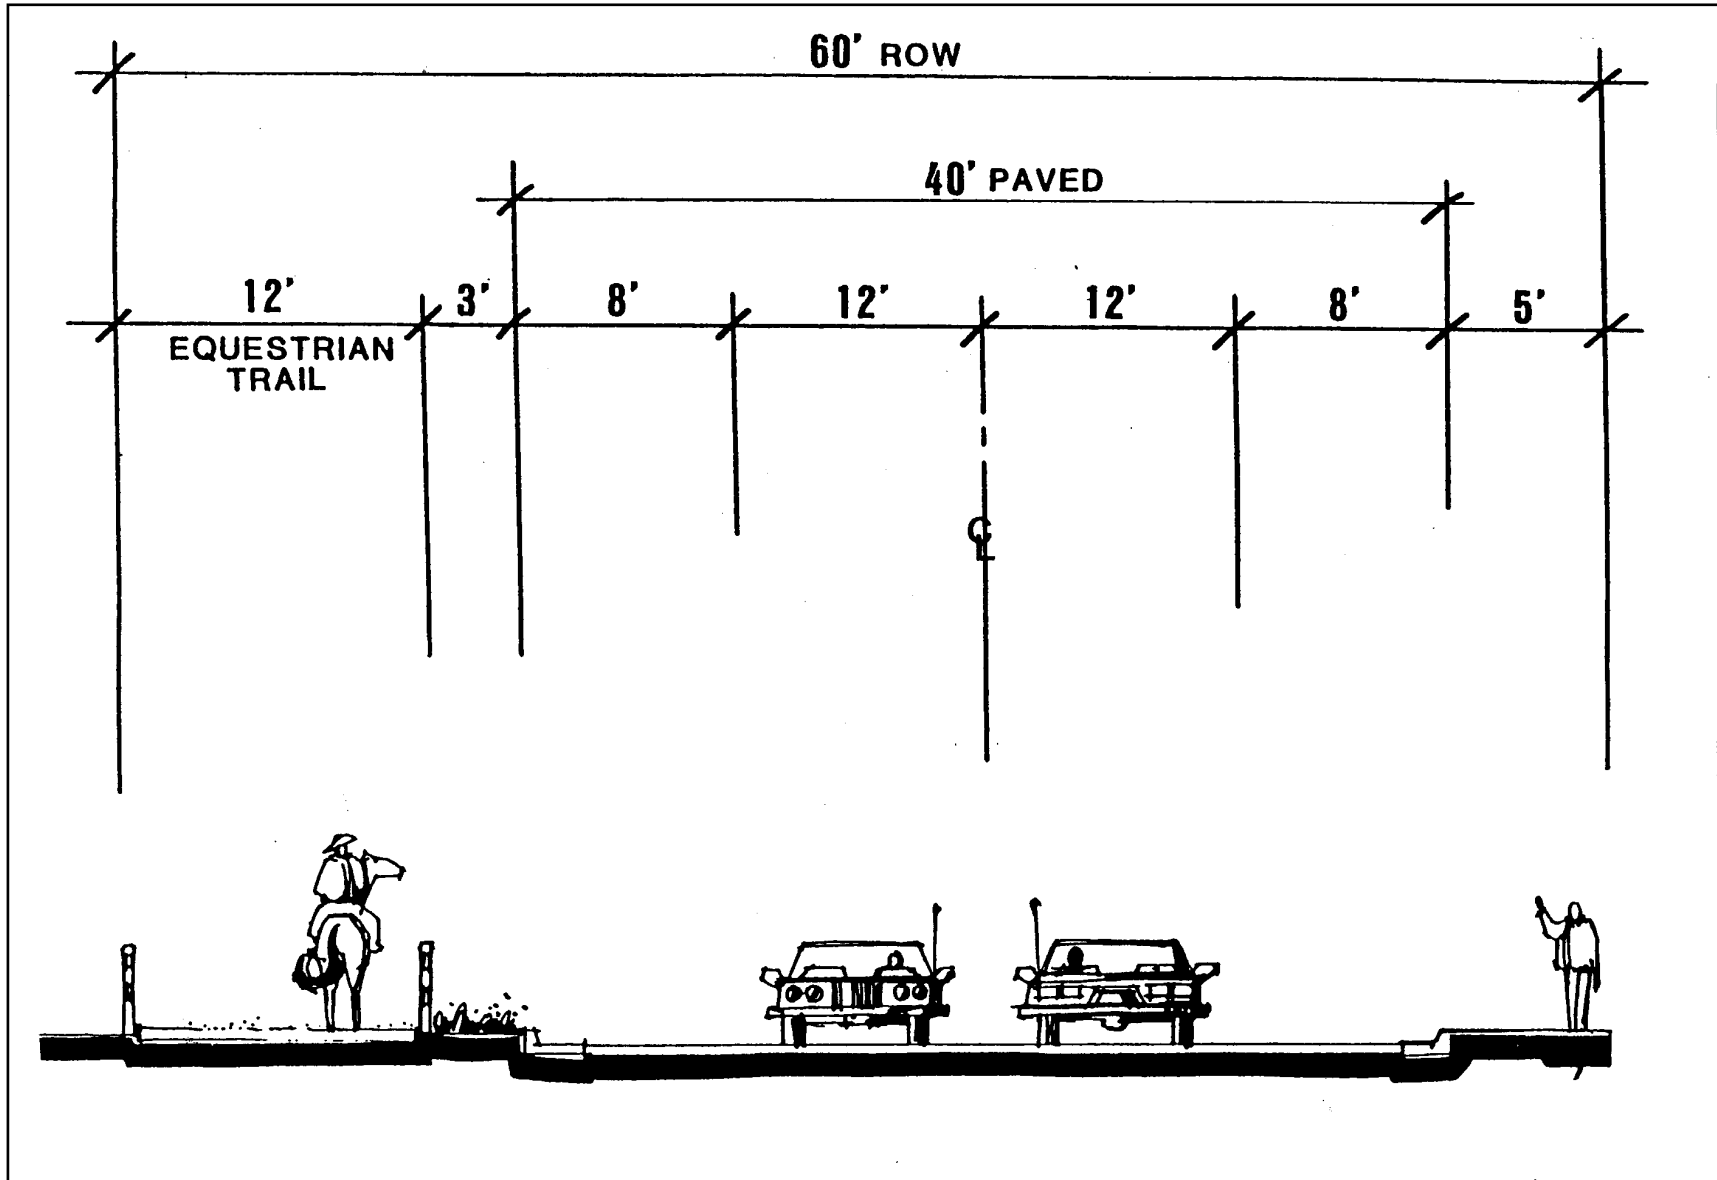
TYPICAL SECTION – CYPRESS STREET AND MESA DRIVE (E. of Birch St.)
